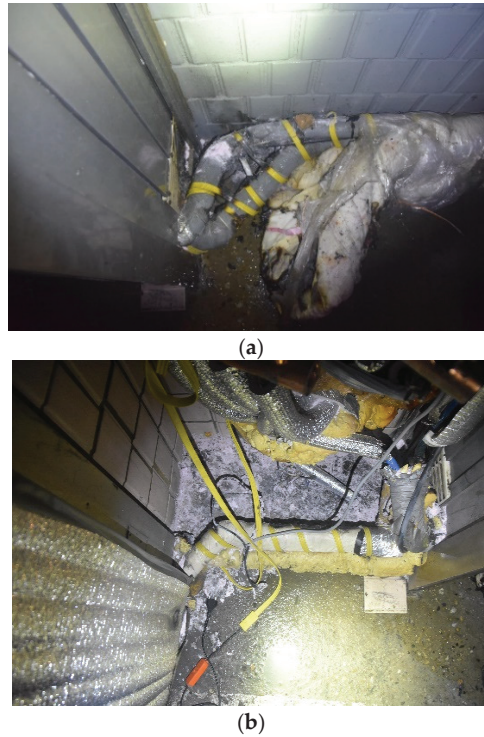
Fire caused by insulations around water service pipes and heating cables wrapped around them. (a) Case 2—Fire site ①. (b) Case 2—Fire site ②.
